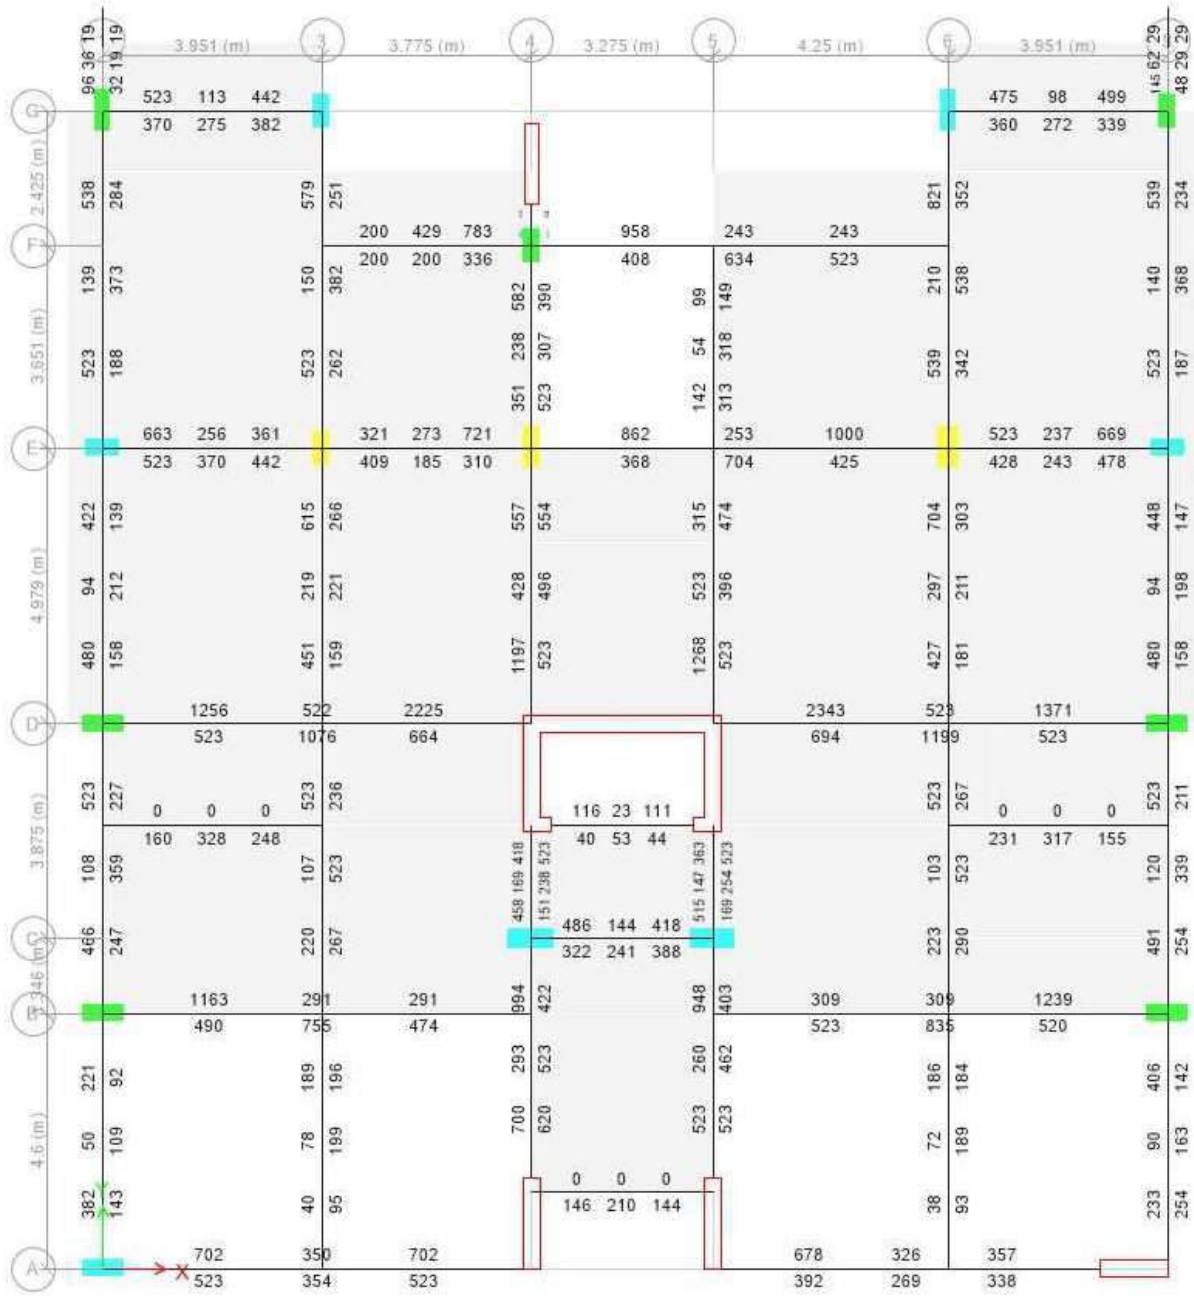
Reinforcement of Roof Floor Beam (mm²)
